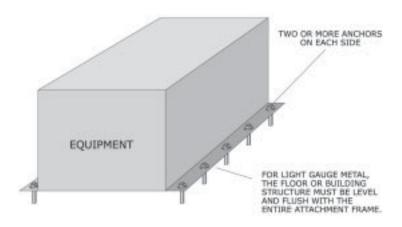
Direct attachment of equipment with sheet steel housing to a building.
